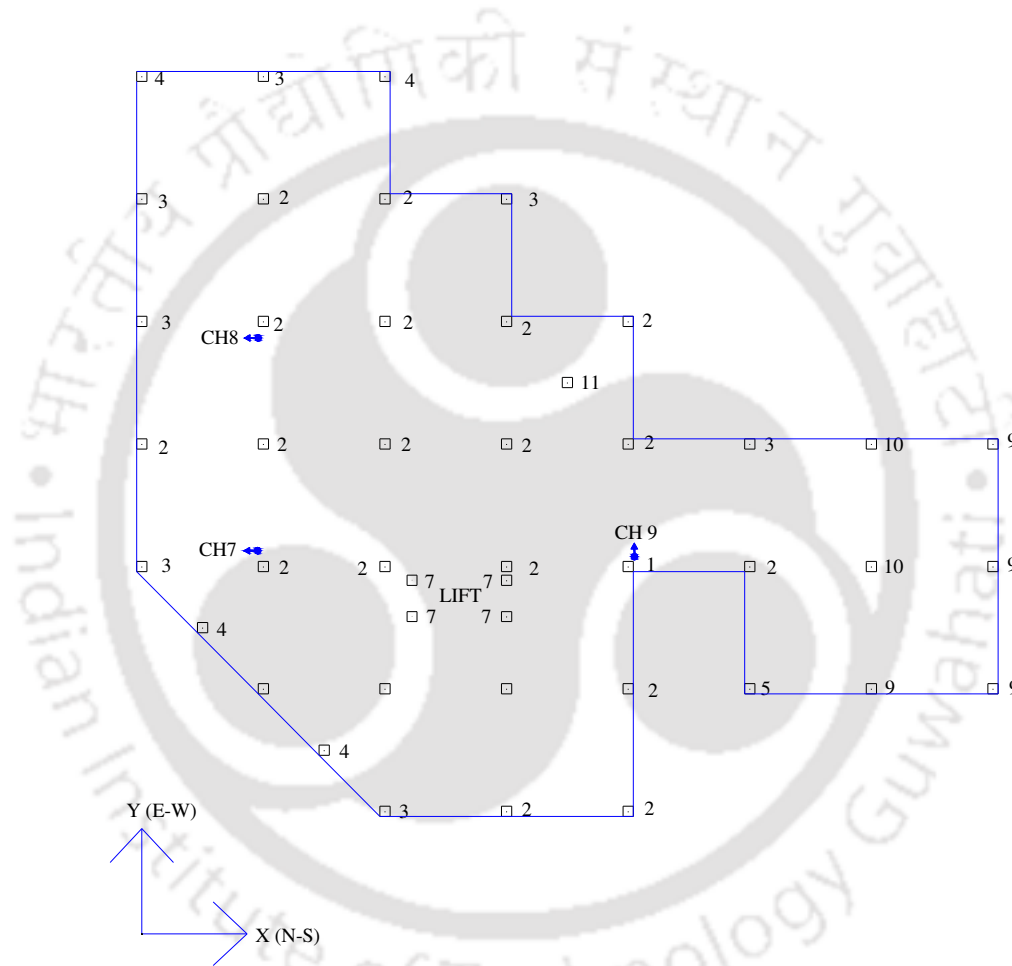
Plan showing column position and sensor location in the third floor of torsionally coupled sample building
